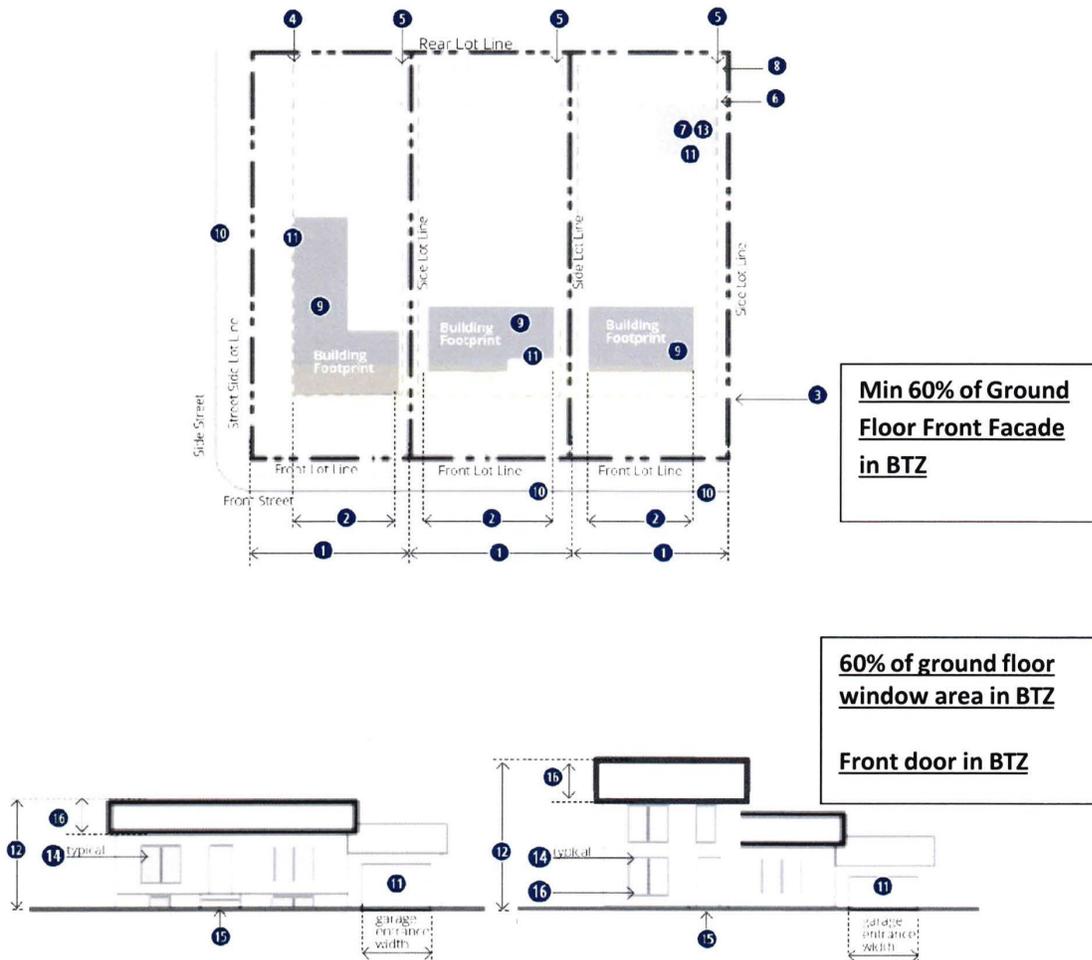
(2). N2 district diagrammatic plans and elevations.
